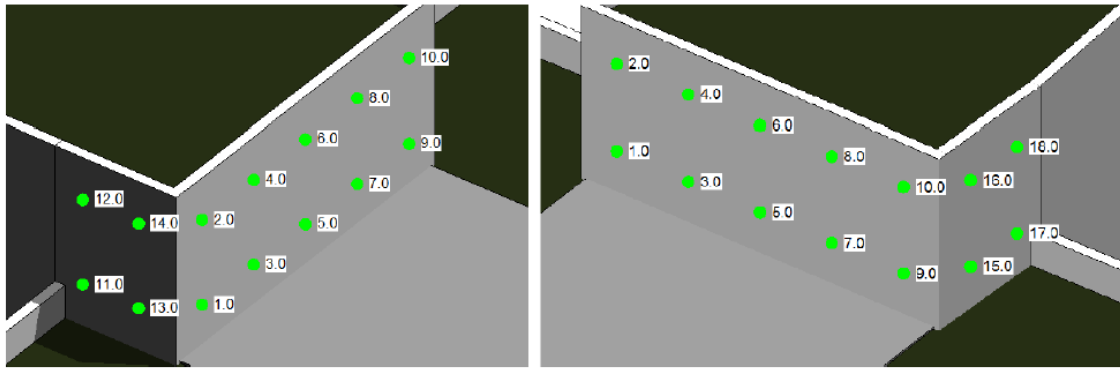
Walls around the elevator of Trindade Station in Porto, Portugal.
